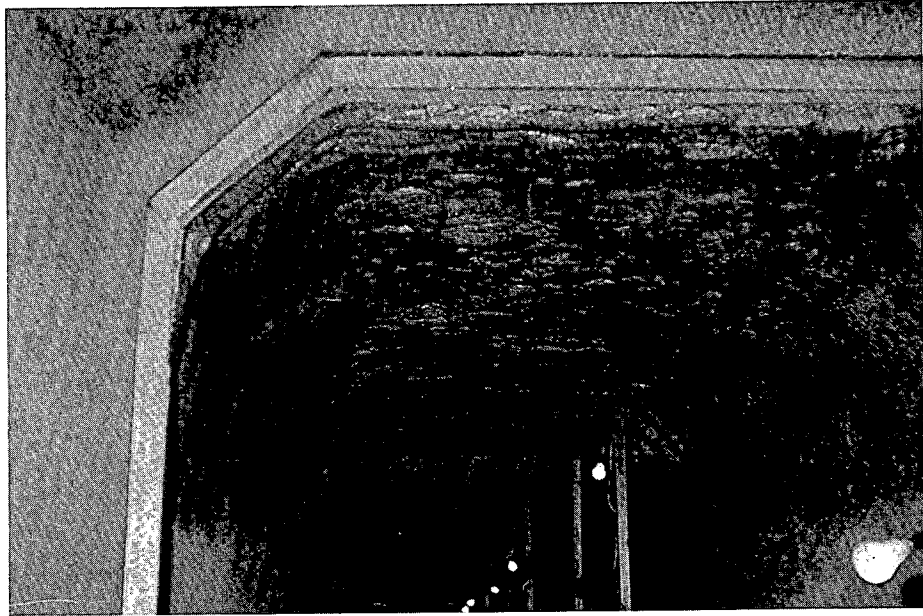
View of jet condenser floor plate and side wall areas. Note the good condition of epoxy coating on wall.
